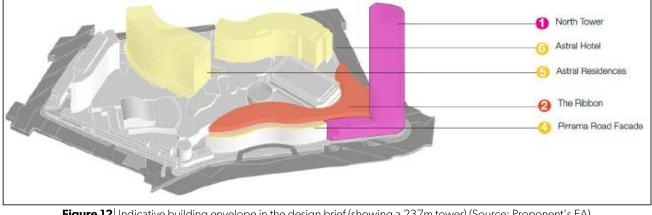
Indicative building envelope in the design brief (showing a 237m tower) (Source: Proponent's EA)
